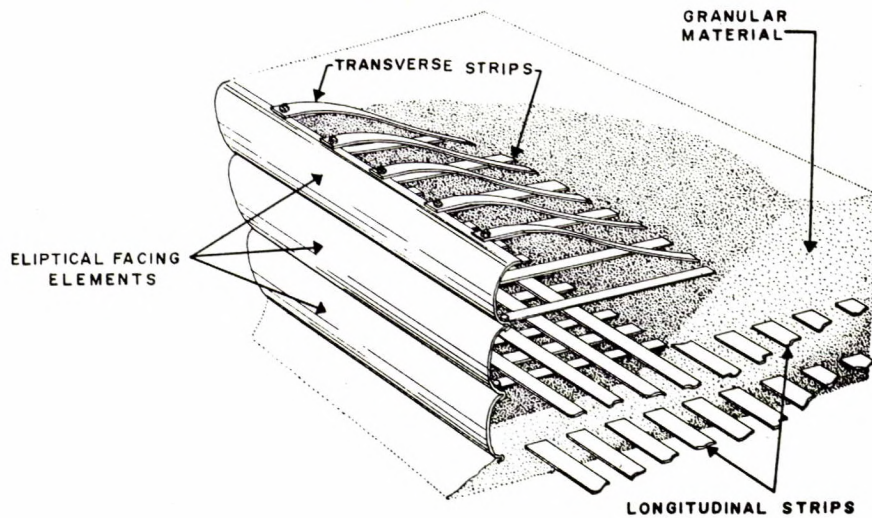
Reinforced earth using elliptical metal facing elements (30).
